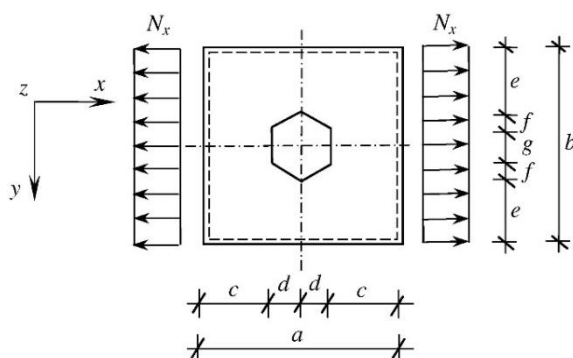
Considered element of steel welded girder with hexagonal hole
